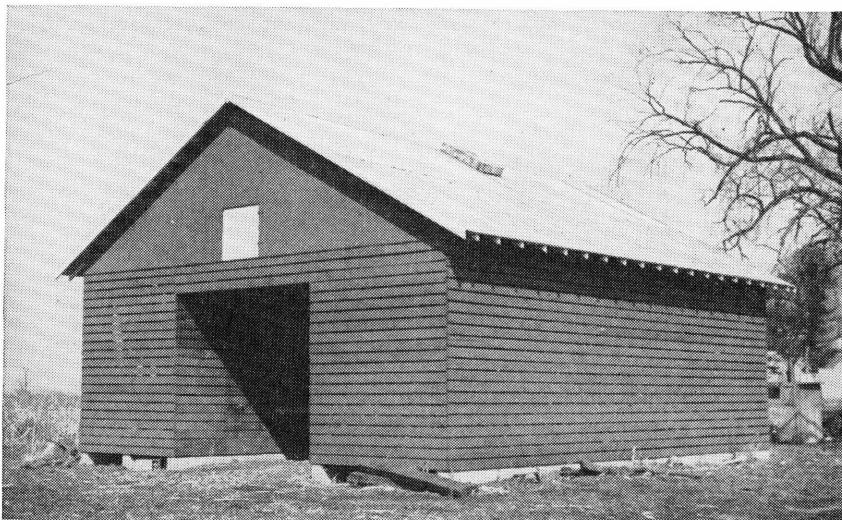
Double crib, each side 8 by 36 feet with a 10-foot wall; no bins above driveway; both cribs filled from one roof hatch. Capacity, about 1,000 bushels of new corn per side. Unless roof pitch is very steep, a crib 36 feet long should have two roof hatches.
